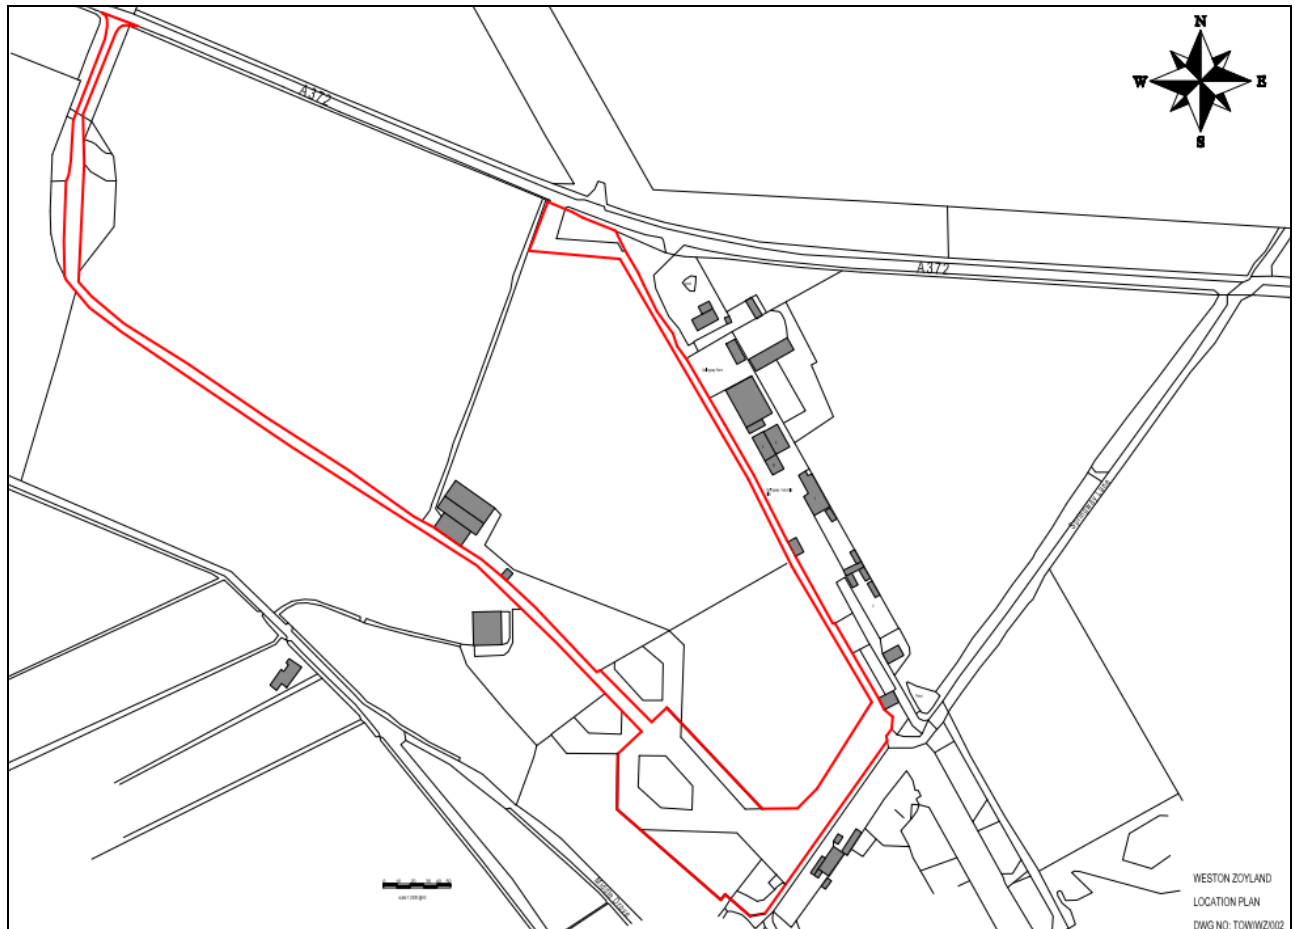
Arrangement of Development Site and Access, to south of A372
